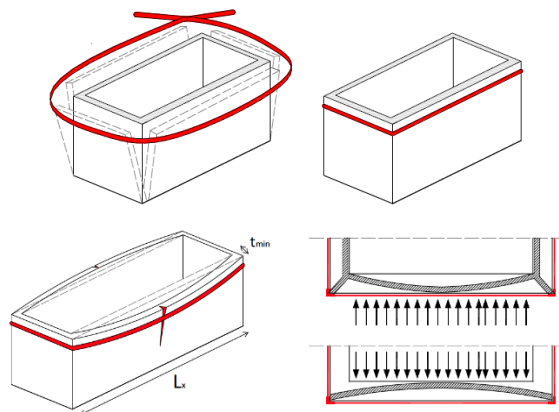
On the top: Scheme of perimetral tying of masonry buildings without roof and/or floor diaphragms. In the bottom: In-plane masonry arch-resistant mechanisms. Representation adapted. From [119].
